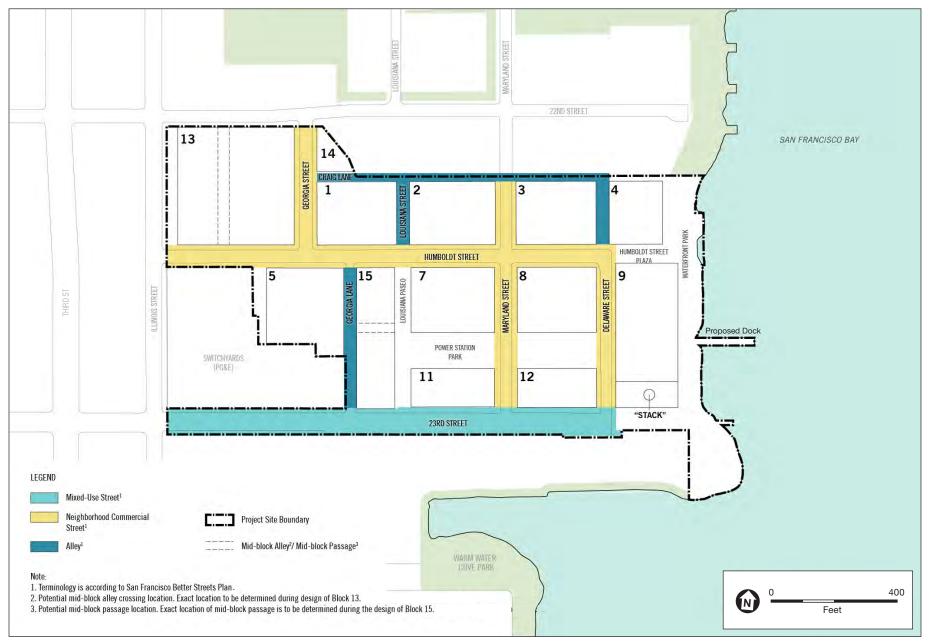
, Project Variant Street Type Plan, shows the proposed street plan, which is essentially unchanged from that of the proposed project, with Georgia Lane abutting the new Block 15 under the project instead of the discrete Blocks 6 and 10 under the proposed project. In addition, Delaware Street and Louisiana Street north of Humboldt street are designated as "Alley" rather than as "Shared Street (curb-less)."
